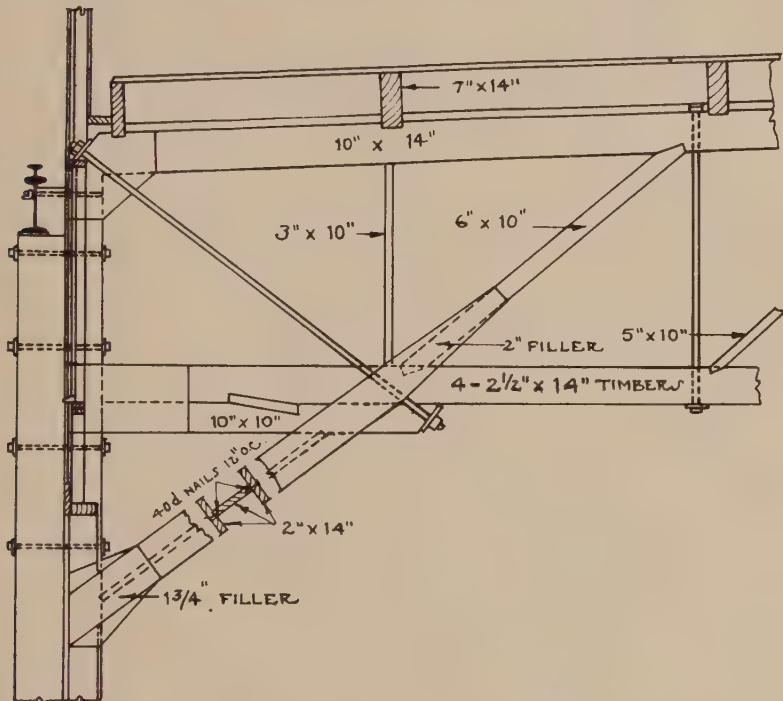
End detailing and knee bracing in a 70-ft. Howe roof truss.
